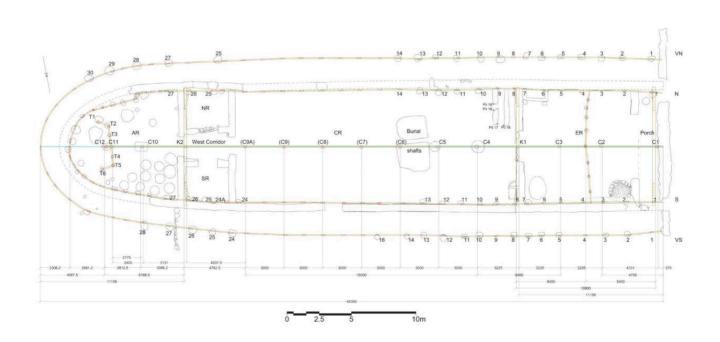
RECONSTRUCTION OF THE INTERVALS BETWEEN THE TIMBER UPRIGHTS ON THE LONG AXIS OF THE BUILDING.
